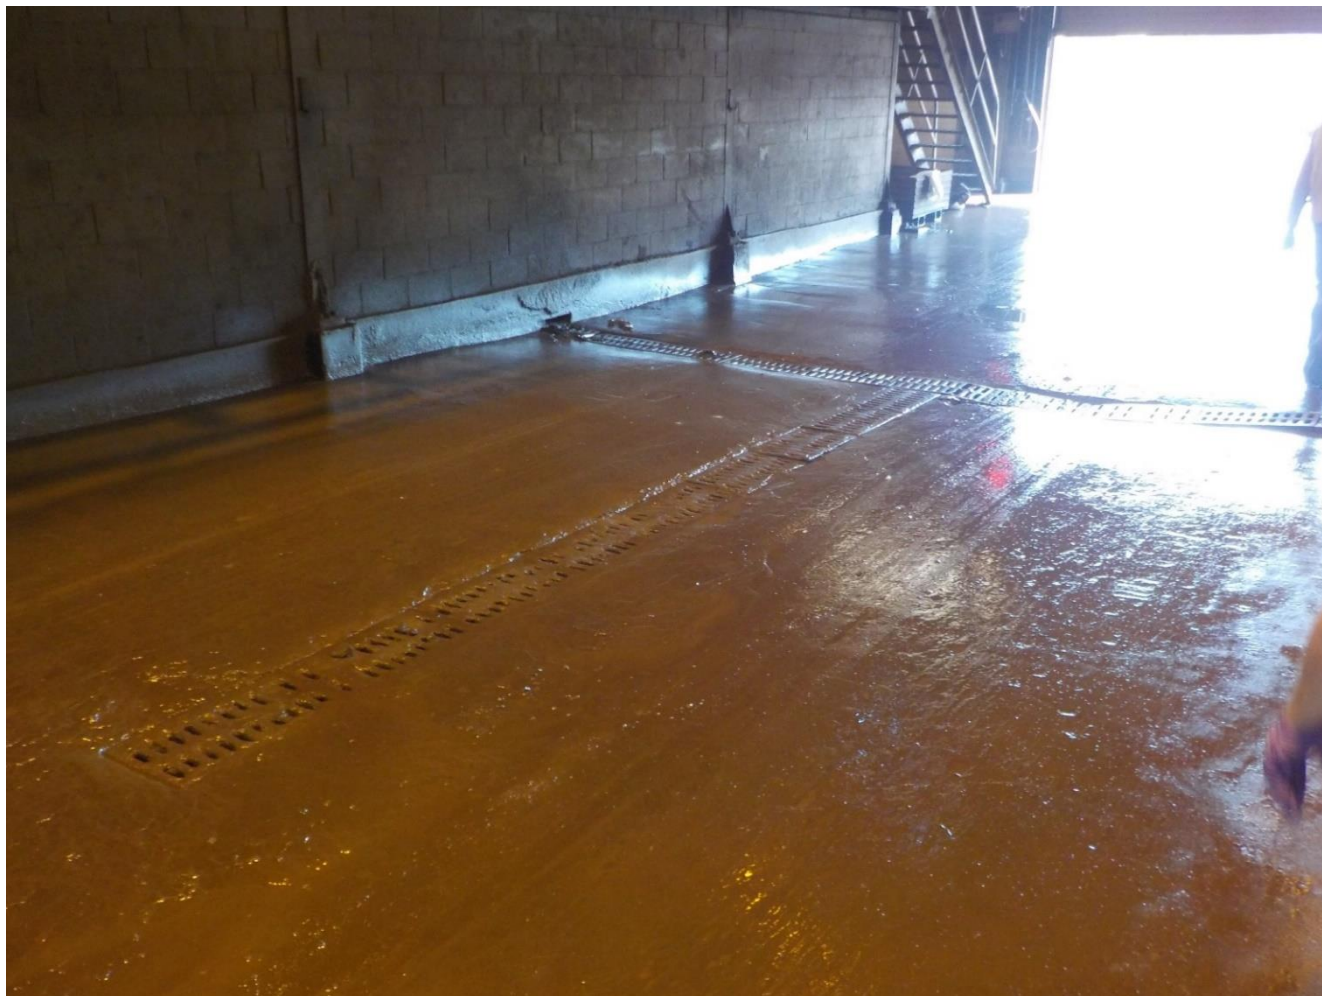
(DSCN0164) This photo shows the T-shaped floor drain in a truck wash bay in Building 624. See also Photo 29.
